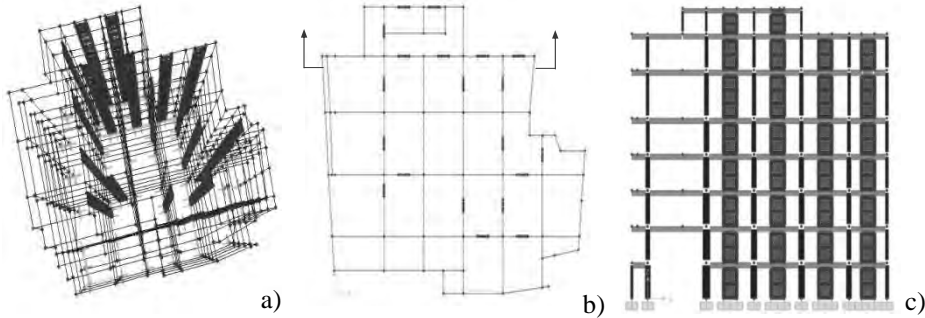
3D bird view (a), plane lay-out at + 15 m (b) and vertical section (c) of the structure retrofitted with steel shear panels.
